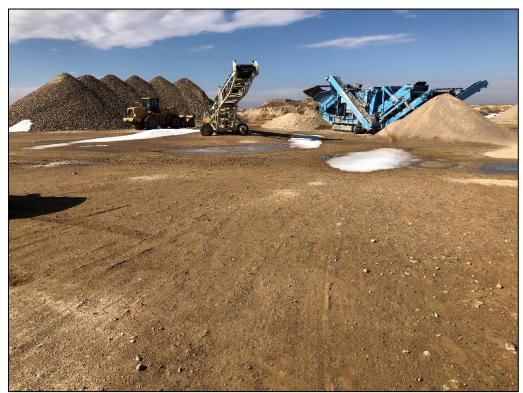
View looking north from pit floor, showing material stockpiles and mobile processing equipment stored on pit floor.
